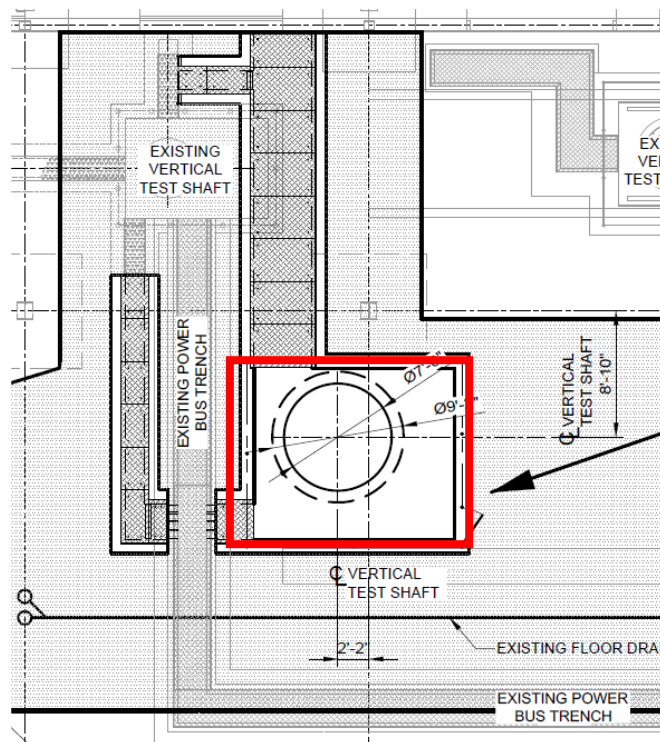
Location plan of the IB1 HFVMTF, from FESS drawing 10-1-223 S-1.
